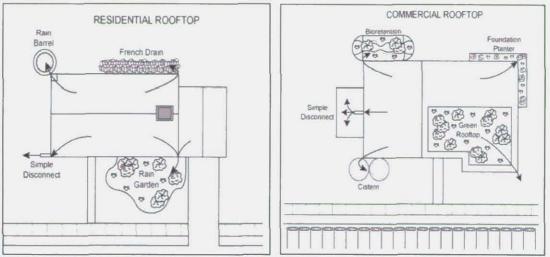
Residential and Commercial Rooftop Disconnection Retrofit Strategies (Source: CWP, 2007)
